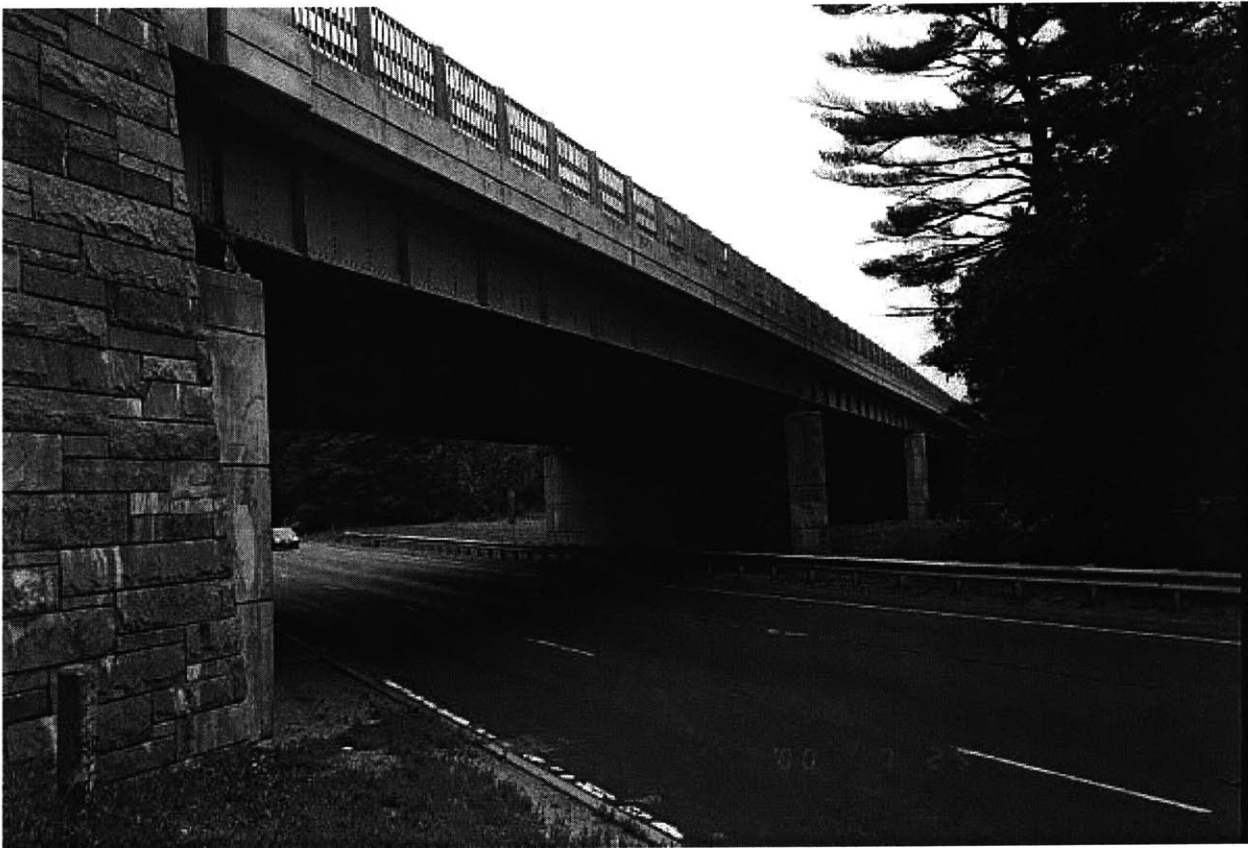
Photo of Existing Treble Cove Bridge [compliments of the MCC Team]
